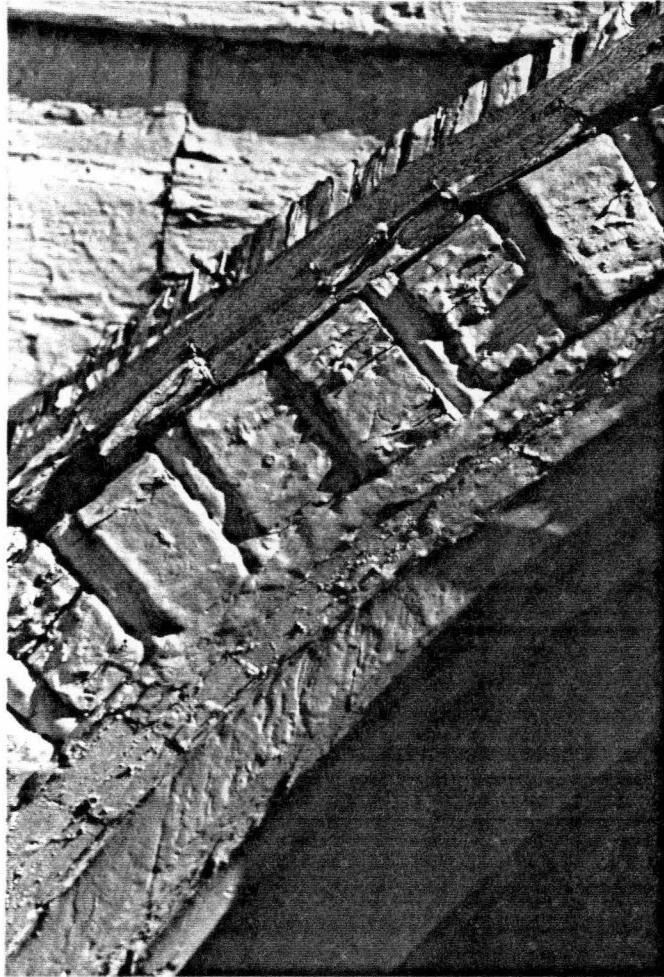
Window casing (north side). Entrance tower west elevation. Note shaped dentils with bead elements in between.
